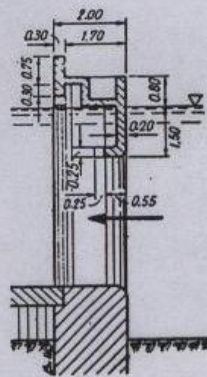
/24. Skimmer wall supported by piers. (After M. M. Grishin)
